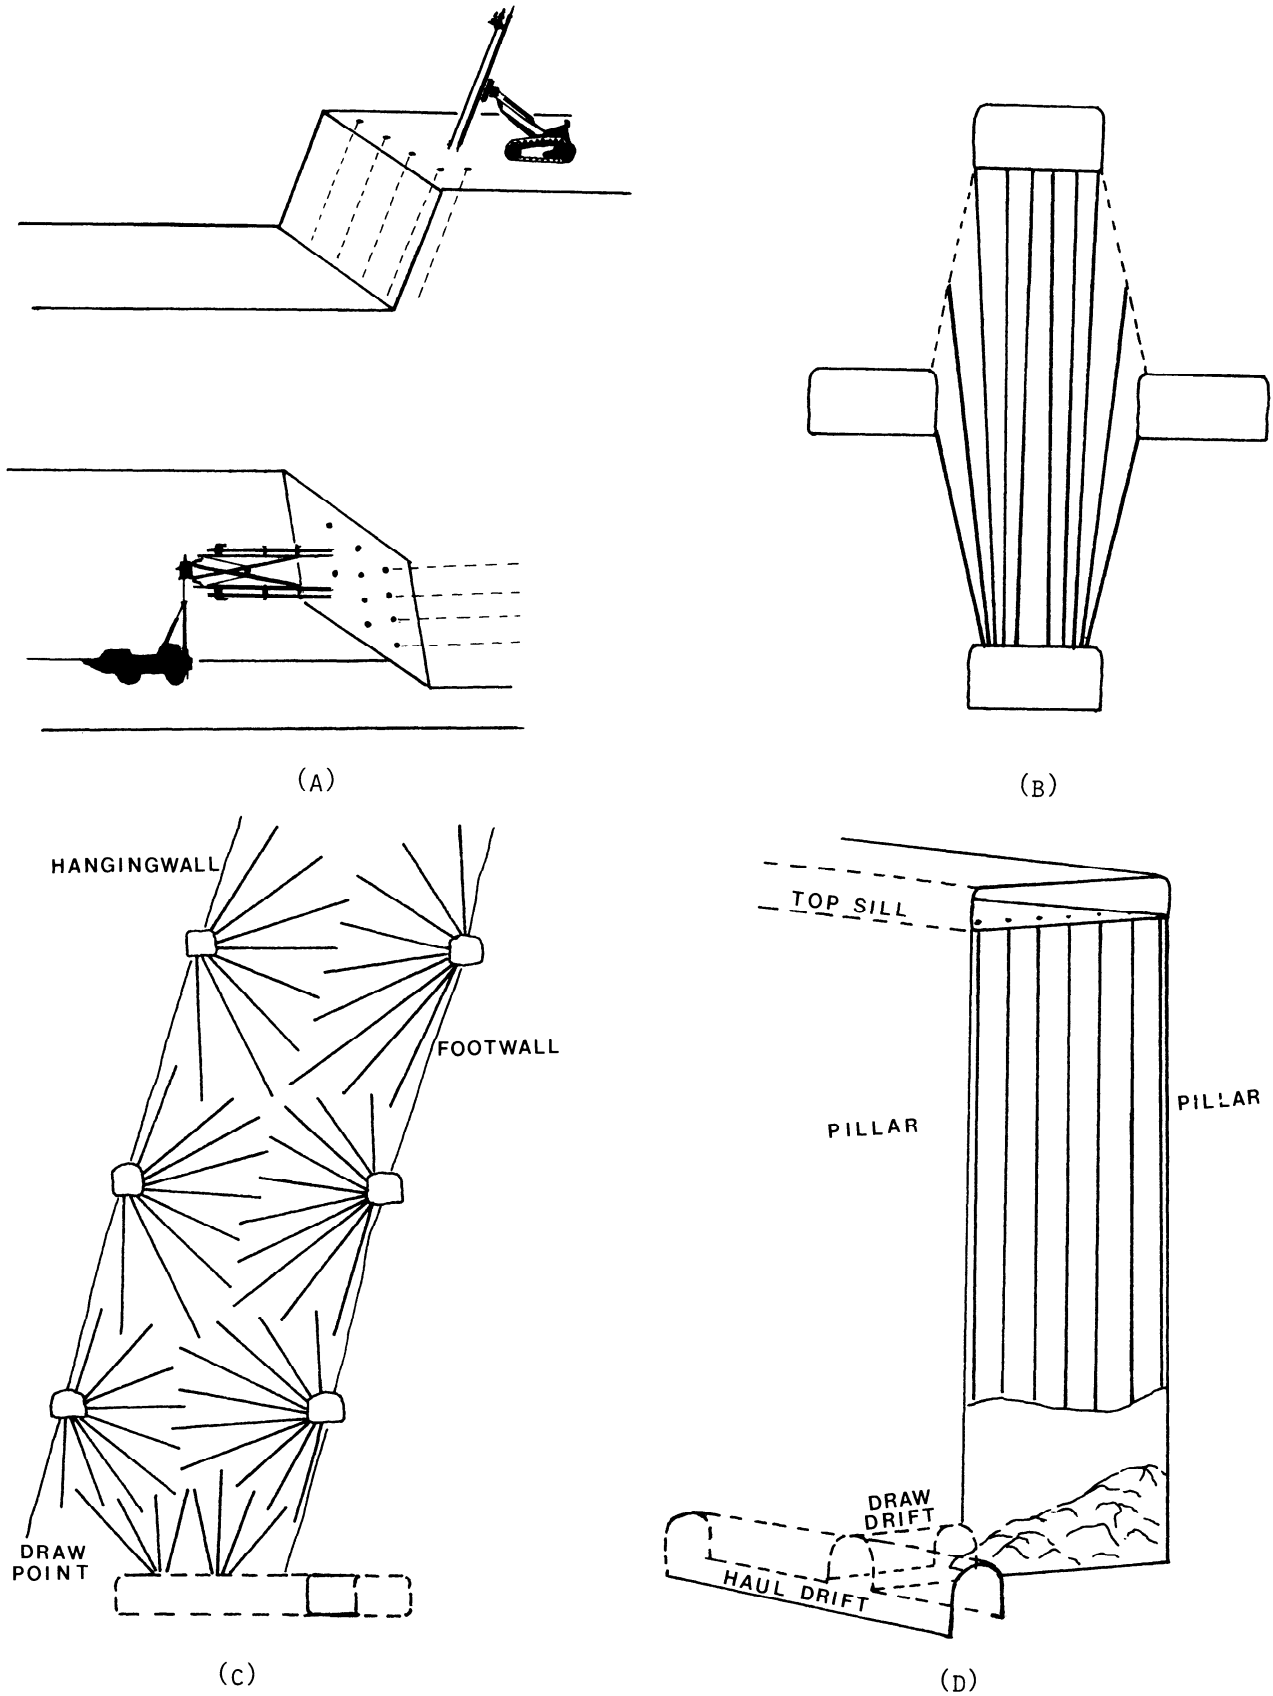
Multiple face drilling patterns for (A) room and pillar, cut and fill, and shrinkage stoping methods; (B) sublevel caving; (C) sublevel stoping; and (D) long-hole stoping or vertical crater retreat methods.
